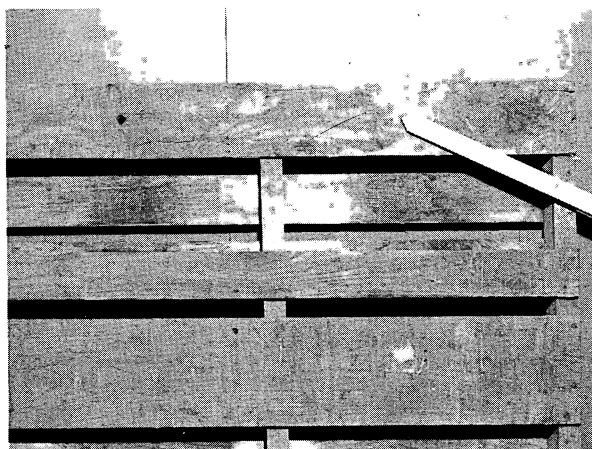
Deep checking on upper face of bottom edgeboard has developed into a split on the bottom face. From left to right pointer indicates length of split.
